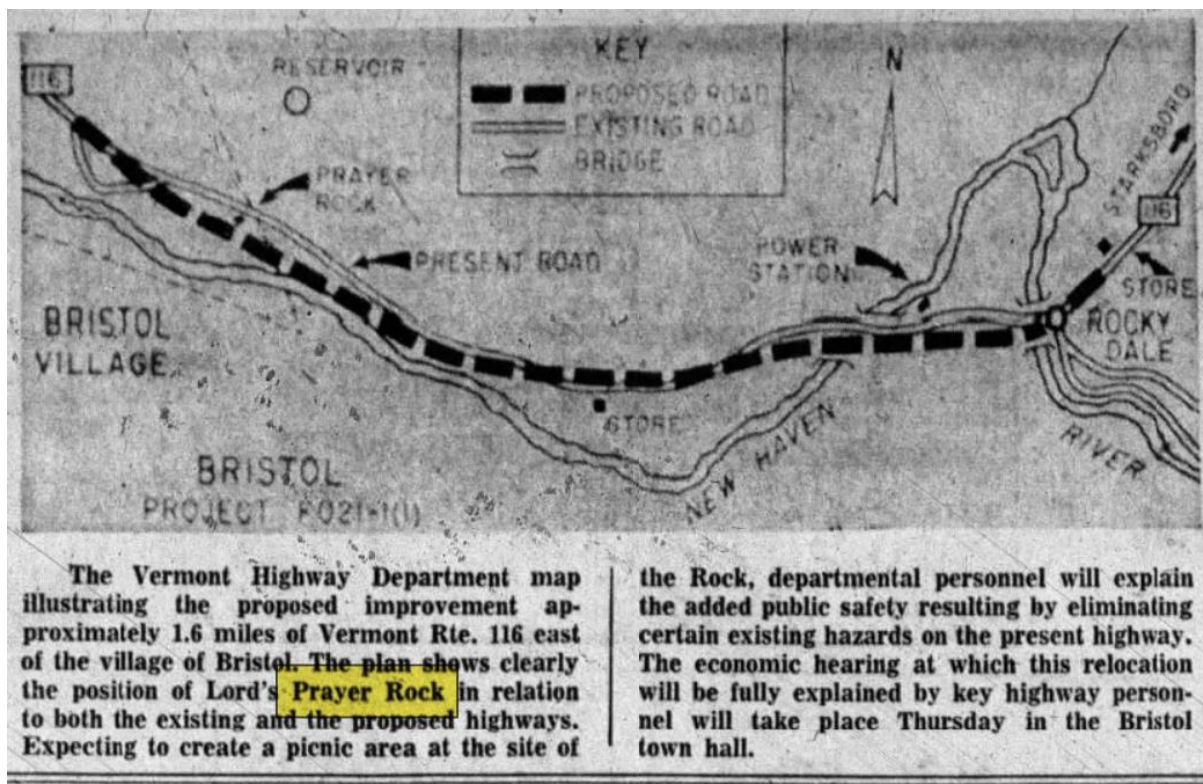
1958 proposed plan to re-align East Street to the south of the Lord's Prayer Rock.
